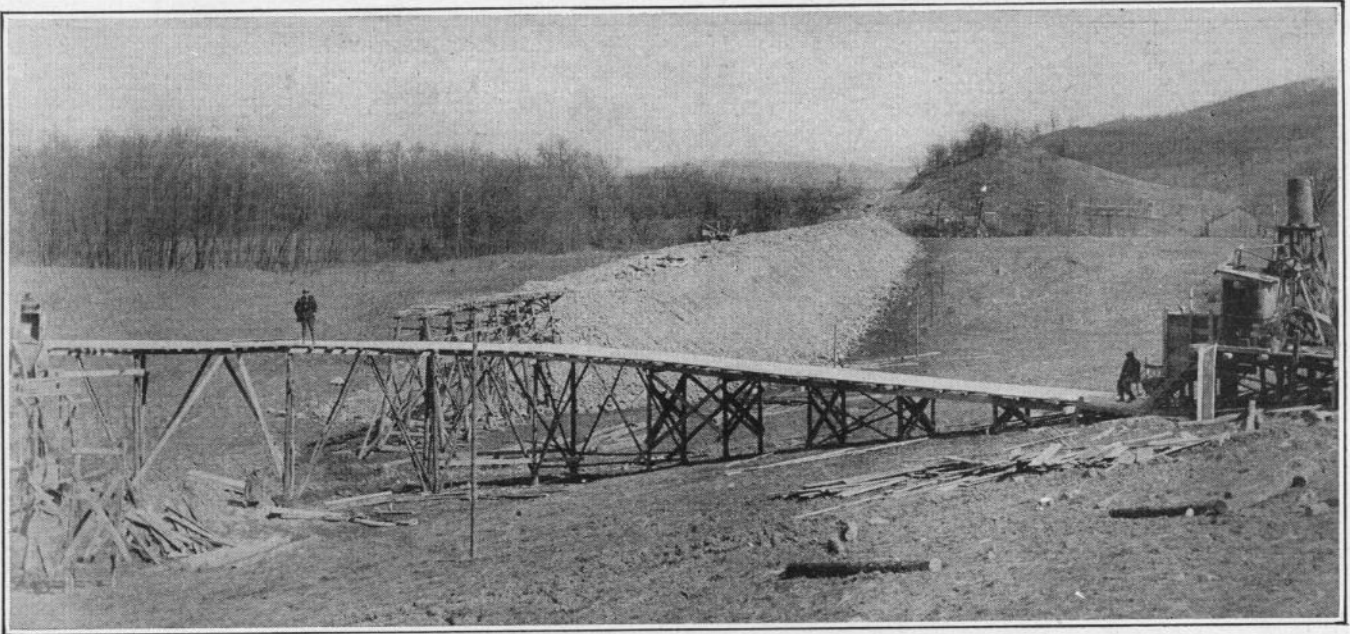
CONCRETING PLANT FOR A HIGHWAY UNDERPASS
